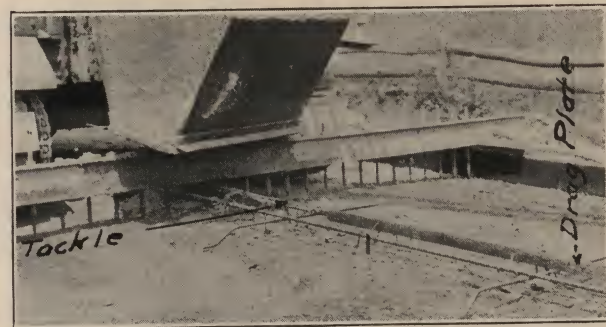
View behind mixer showing scratch board, center reinforcing unit, dowels and Drag Plate with cable connection to mixer
